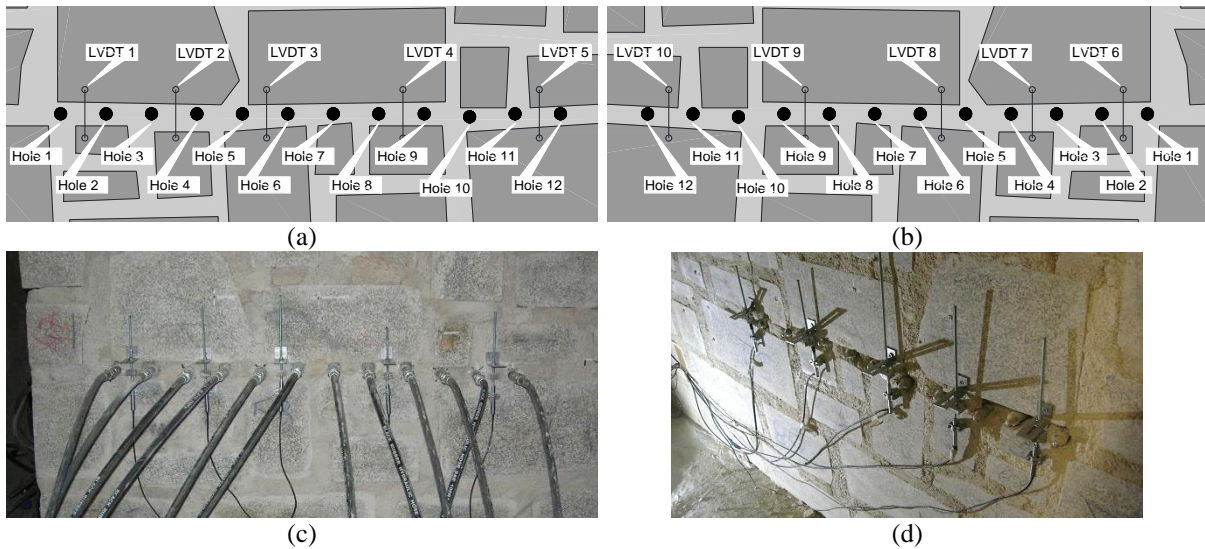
Holes and LVDT positions for the first single tube-jack test in the semi-irregular wall: (a) front of the wall; (b) back of the wall; (c) tube-jacks inserted in the front of the wall; and (d) tube-jack ends sticking out the back of the wall
